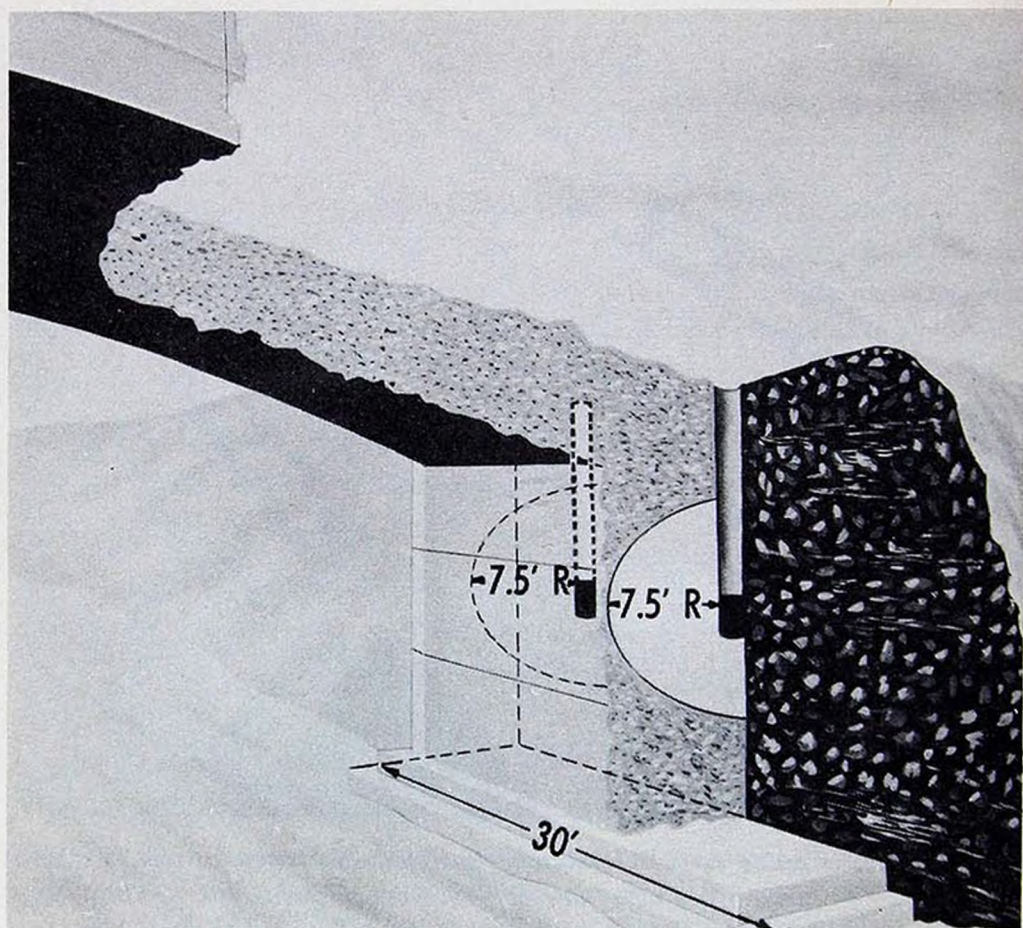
Two charges in the fill behind a reinforced concrete abutment more than 5 feet thick.
